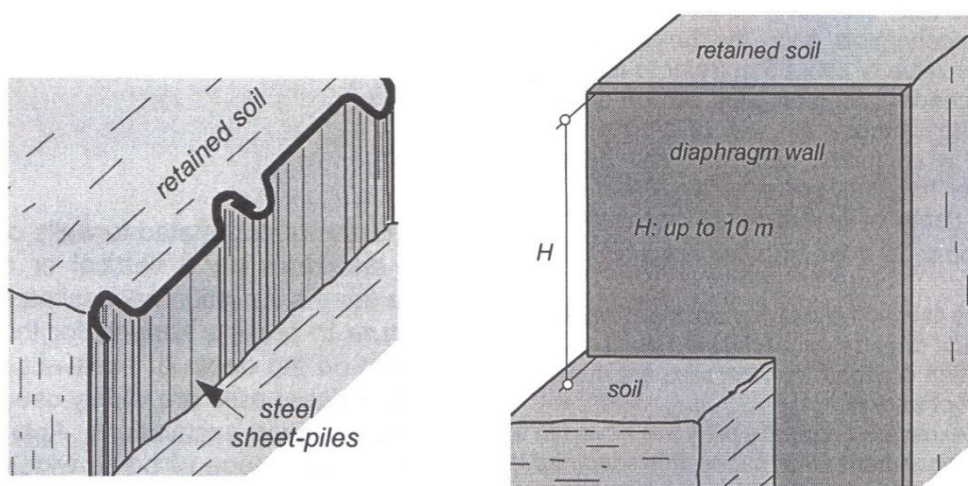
Examples of sheet-pile wall and diaphragm wall (Azizi, 2007).
